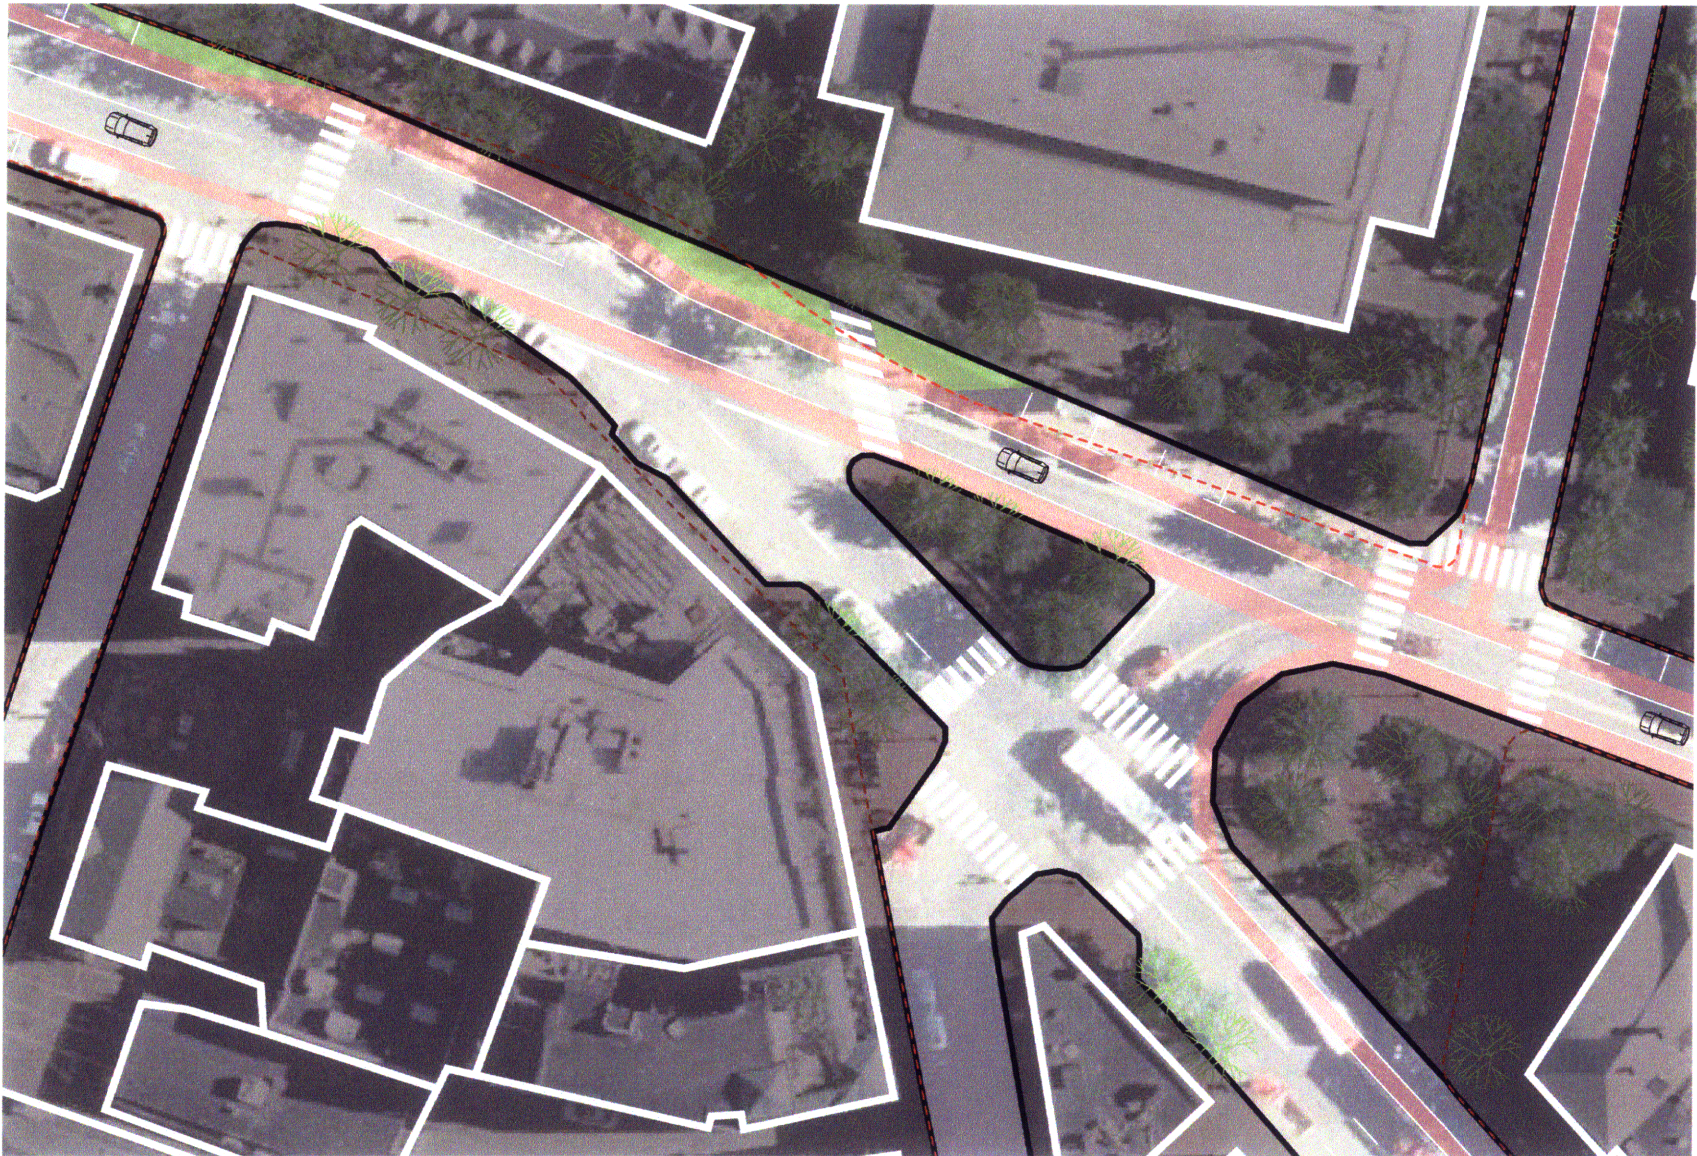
The connection of cycling traffic between Massachusetts Avenue and Harvard Street.
